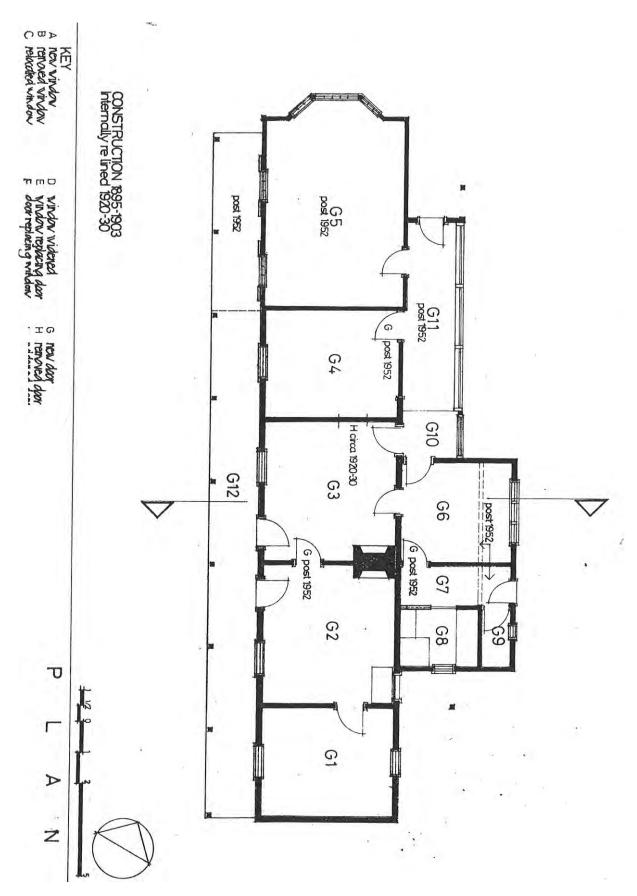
Plan of Constable's Cottage showing changes to the fabric. (Source: Gojak, D, c1985, Site Notes on South Head, courtesy of National Parks and Wildlife Service with GML overlay)
